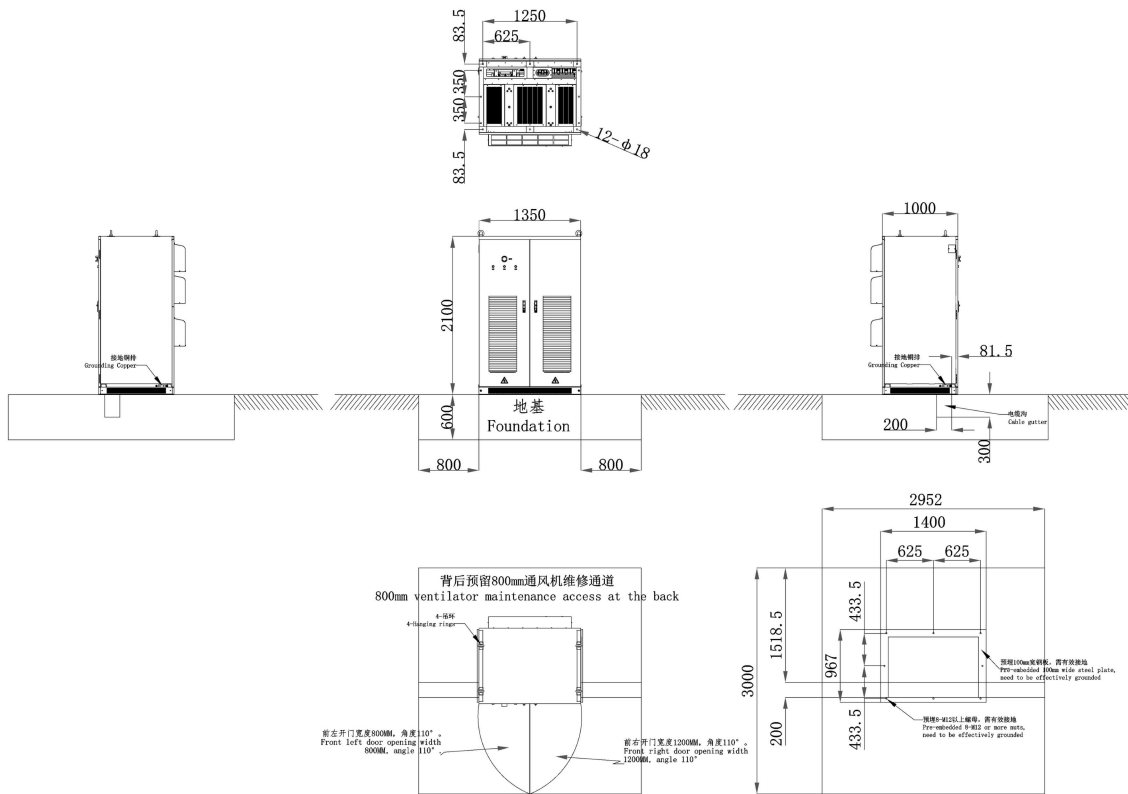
Monet- (DC500) Basic reference drawing (the actual external dimensions of the equipment are subject to shipment)
